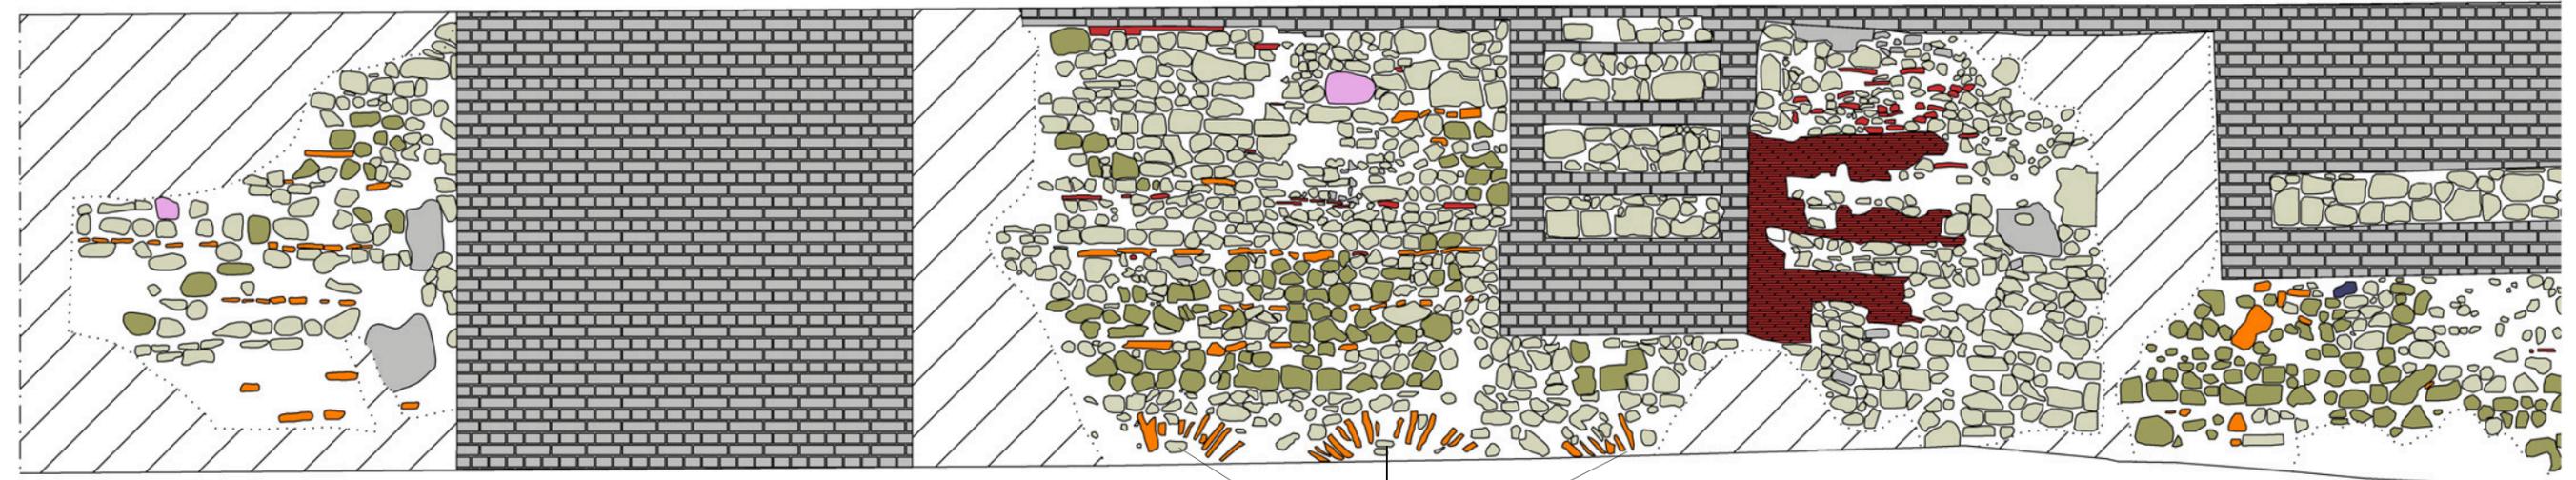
Detailed plan showing sections of wall shown in subsequent figures.
